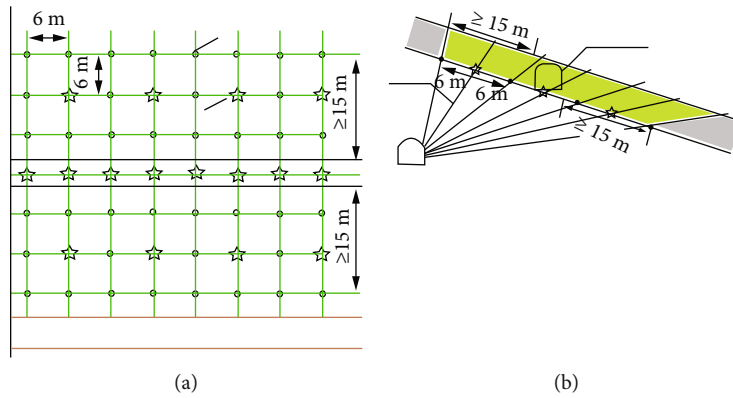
The layout of hydraulic perforation and hydraulic fracturing drilling. (a) The whole and (b) the local.
